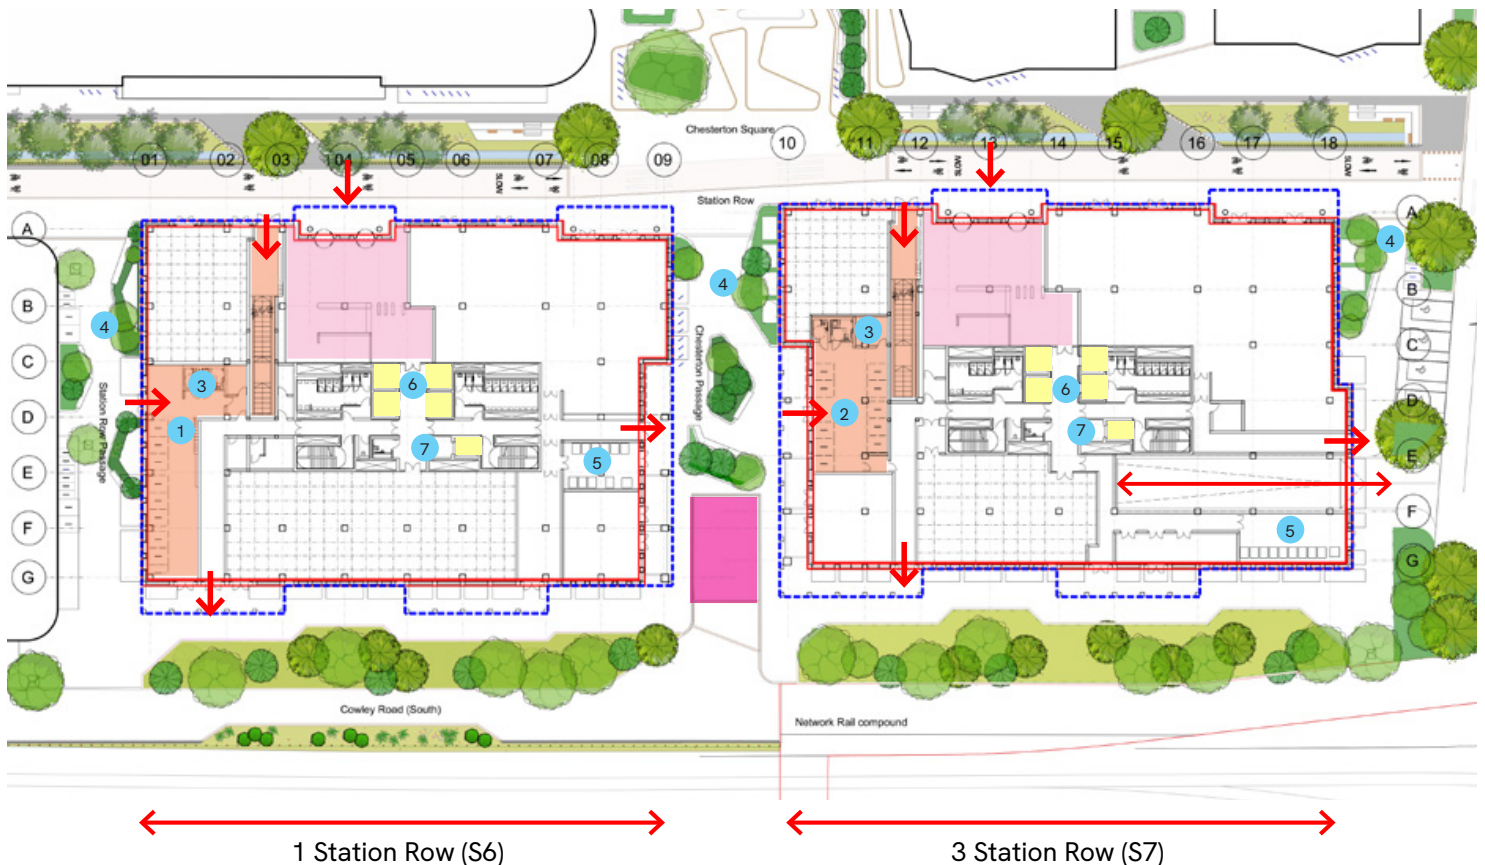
Ground floor plan showing access and movement strategy. (CD2.75).
